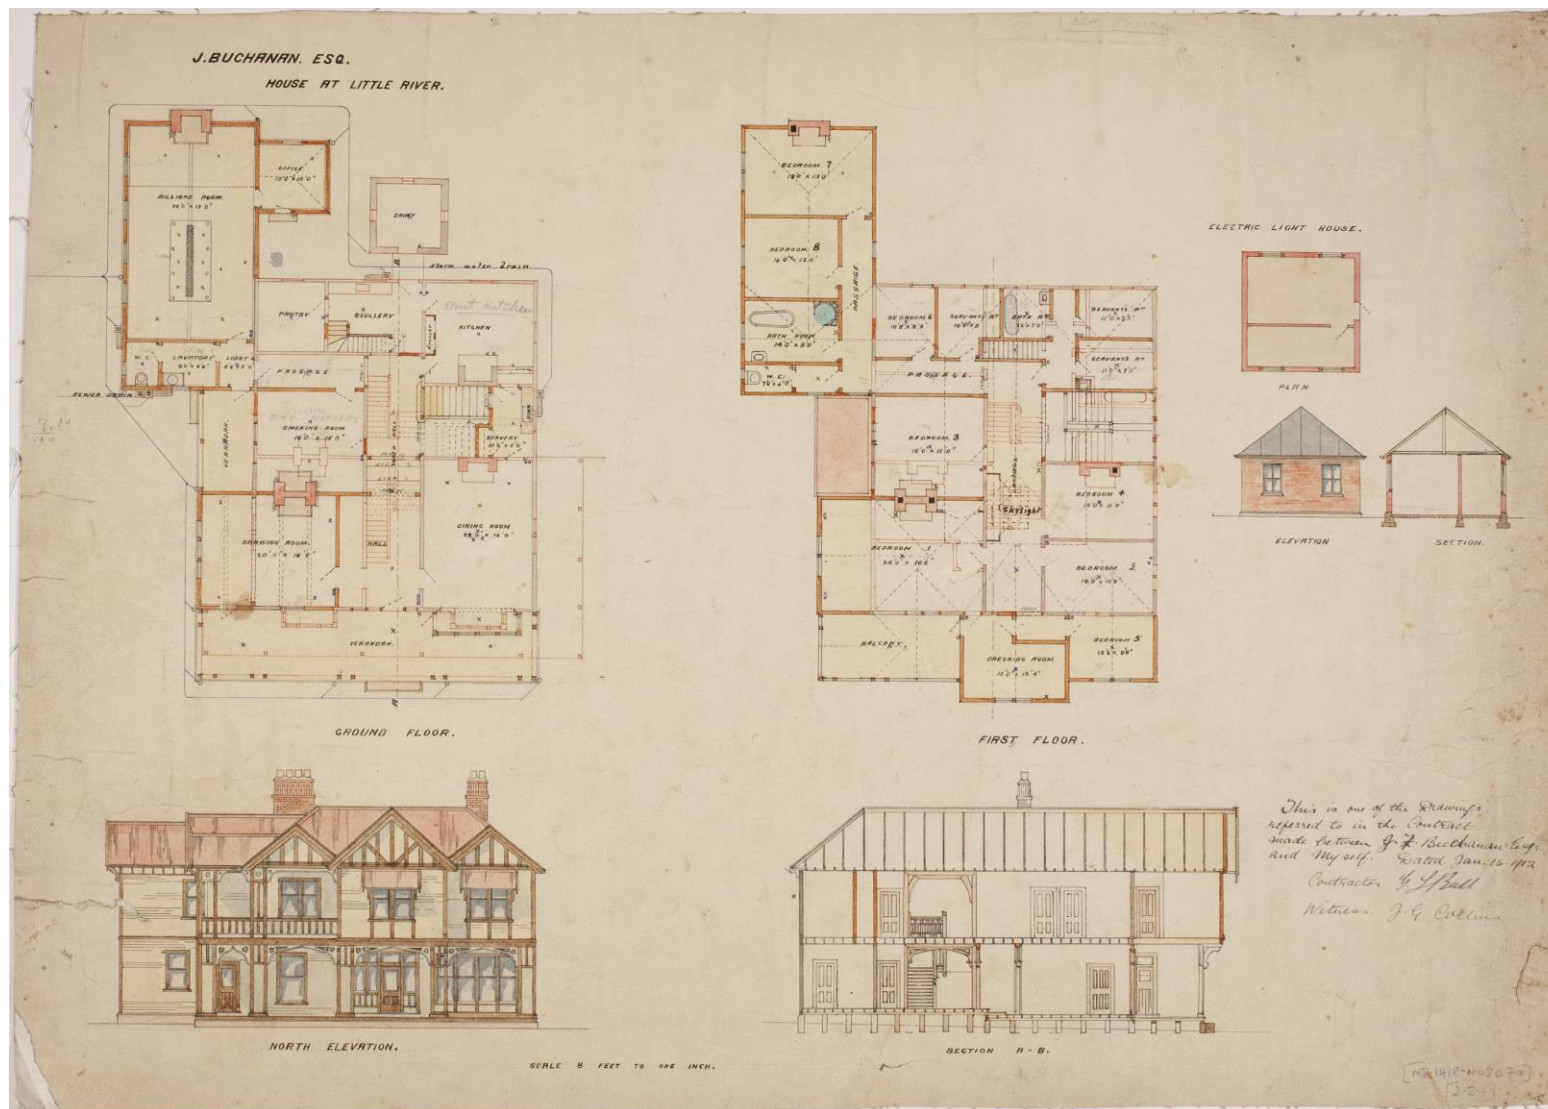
Collins and Harman, J. Buchanan, Esq., House at Little River, plans, elevations and sections (1912).
